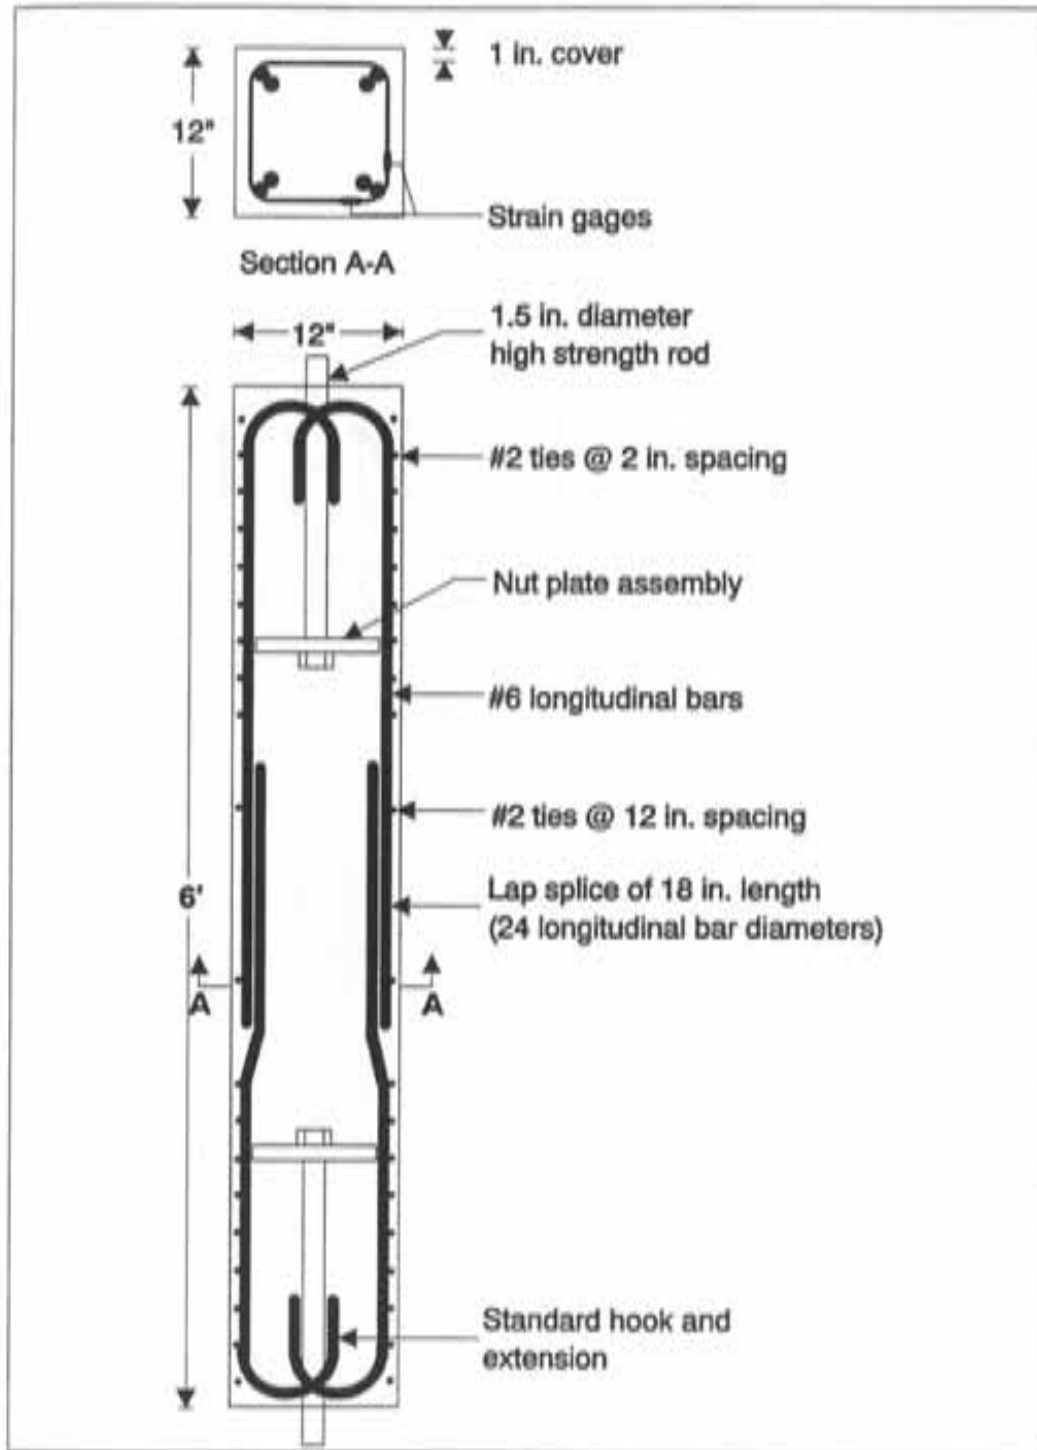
Test specimen with existing (unstrengthened) splice details
